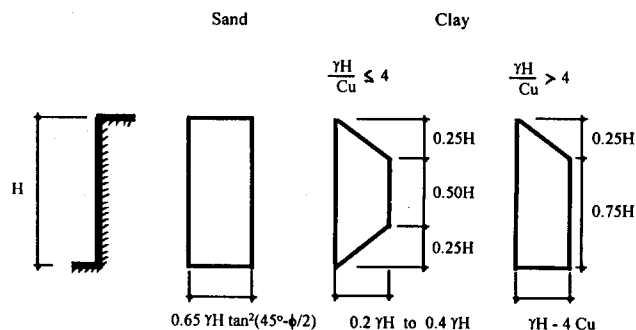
Peck's Diagrams for Apparent Earth Pressures
